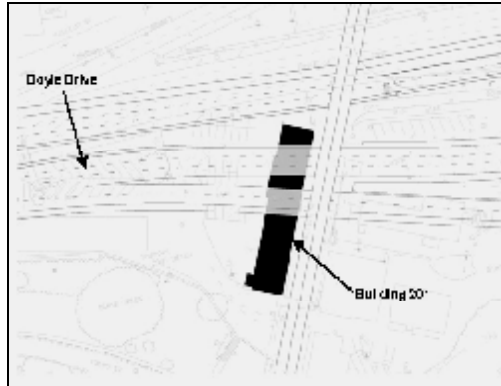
Use of Building 204 with Preferred Alternative
